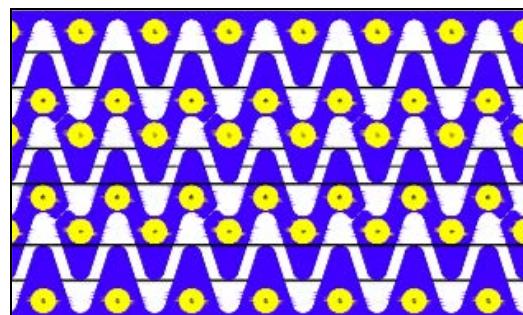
Drawing of plan view of a three-gap modular joint with sinus plates
